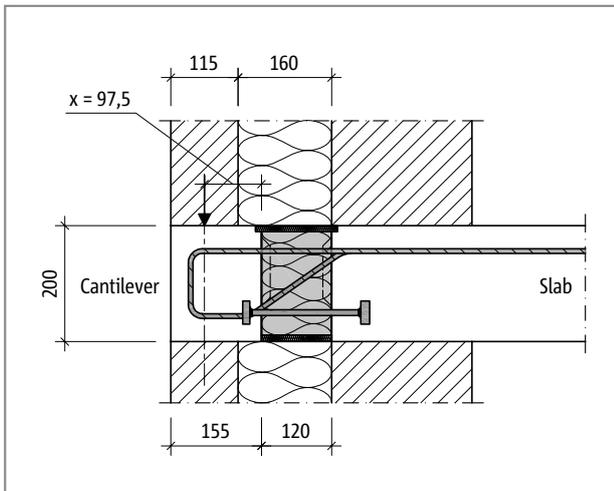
Schöck Isokorb® XT type O: Wall construction for design example
